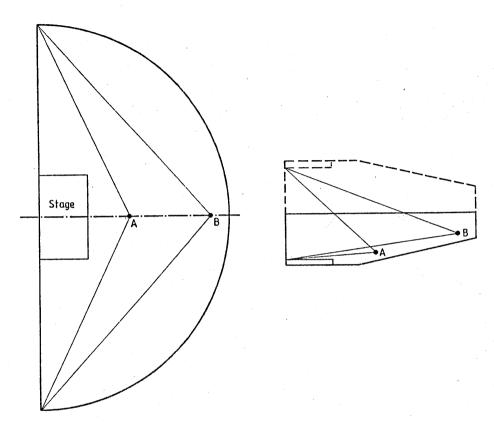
Plan and long section of a semi-circular hall showing angles subtended by the front wall at two receiver positions. Section shows the image of the hall in the ceiling.
